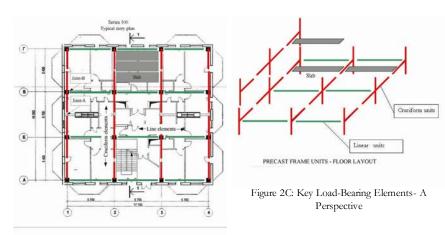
B: Key Load-Bearing Elements Shown on a Building Plan
